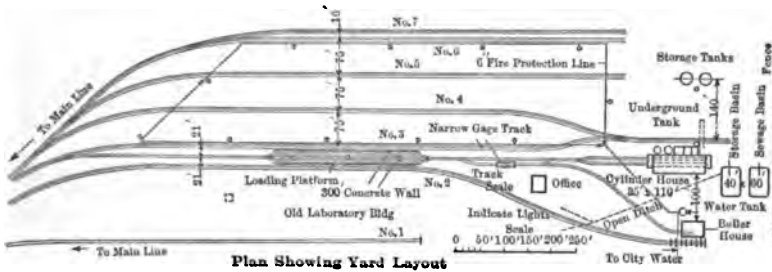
Plan showing layout of a typical wood preserving plant. (Drawn through courtesy of the Ry. Eng. and M. of Way.)
